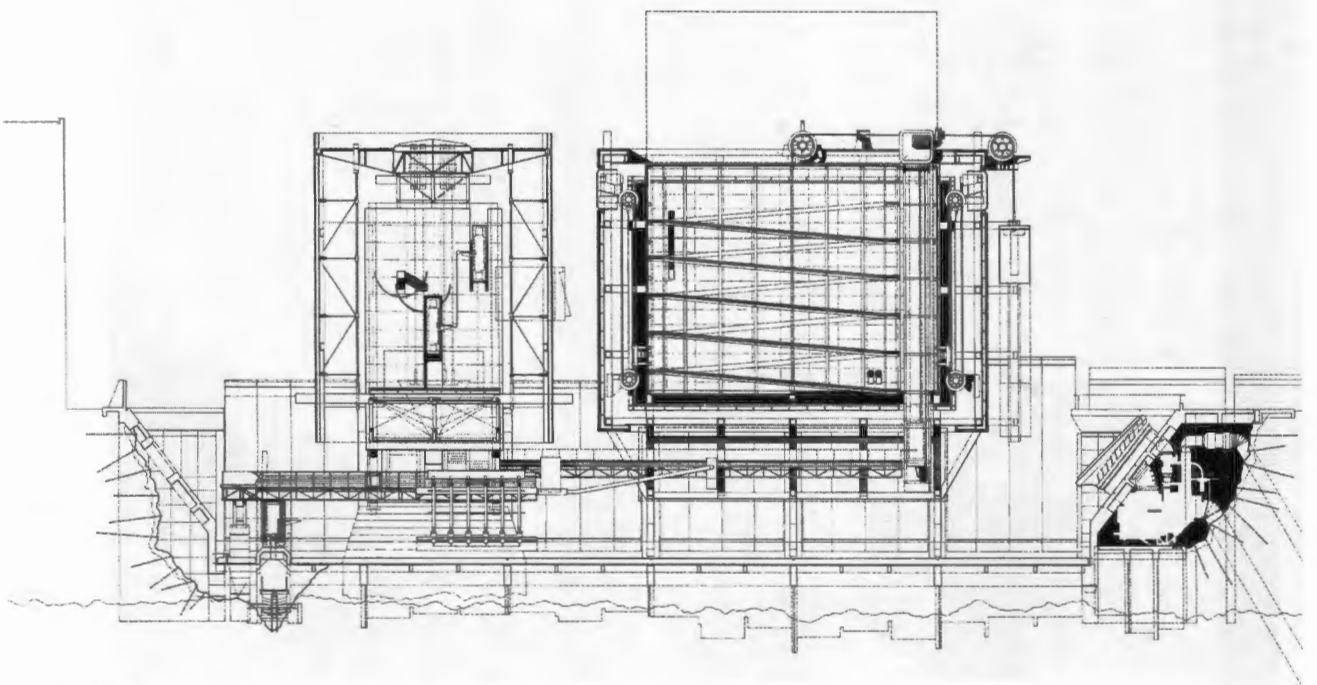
Cross section looking towards the ocean. From left to right: Bridge/Pier, Hull, Hatch/Shutter with walkways, Geothermal Power Plant.
